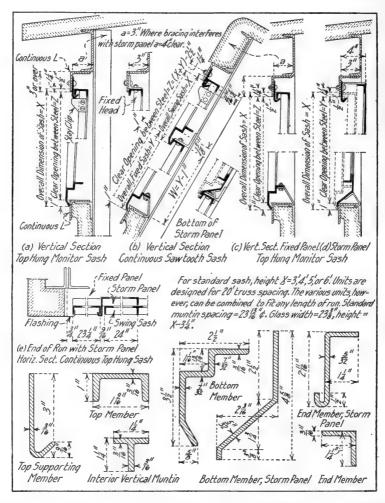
Details of "United Steel Sash" Ventilators and Skylights.
